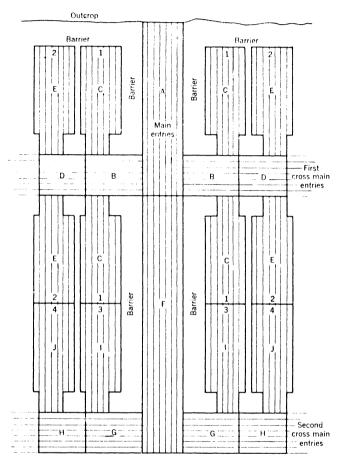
Schematic plan of development of a pillar-mining system from the outcrop.⁽⁷⁾
